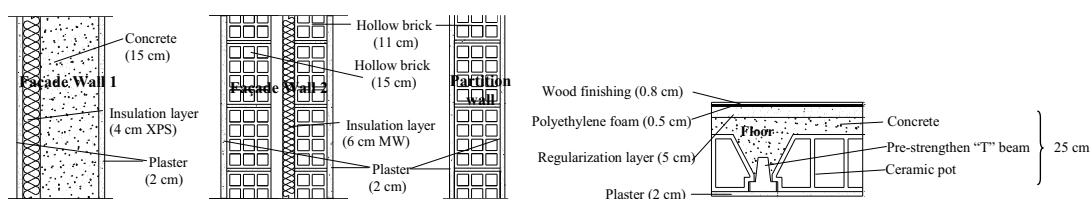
Vertical cross-section of the construction solutions of the walls and floors of the buildings (façade walls and partition elements)
